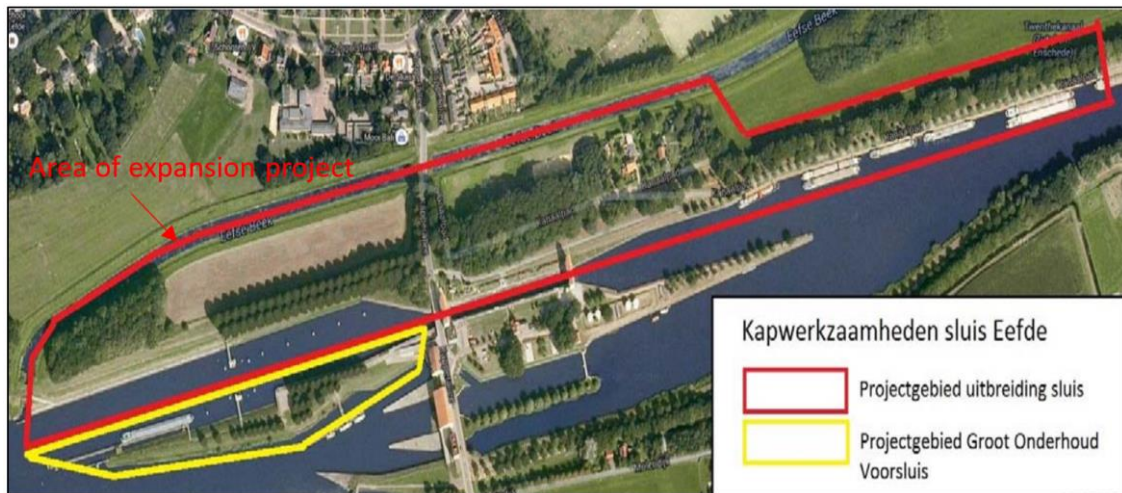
Plan of new chamber (Rijkswaterstaat [RWS], 2016)
